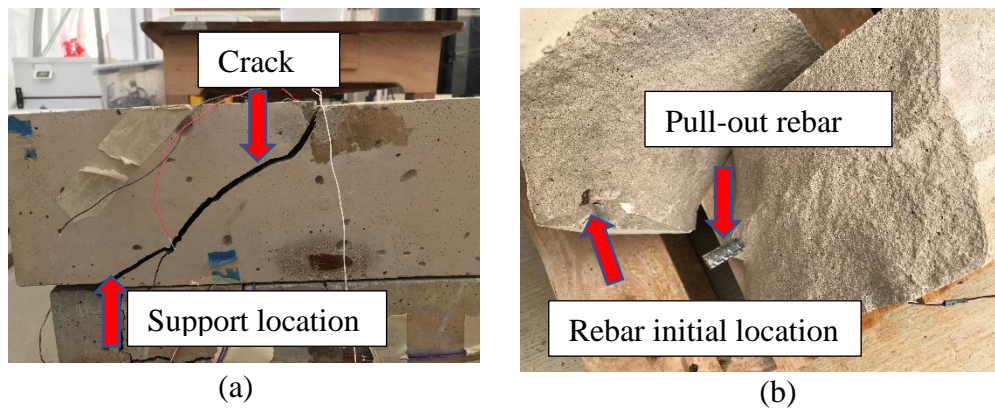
Concrete prism failure due to rebar pullout (a) Crack pattern of Mix P after bending (b) rebar pullout
